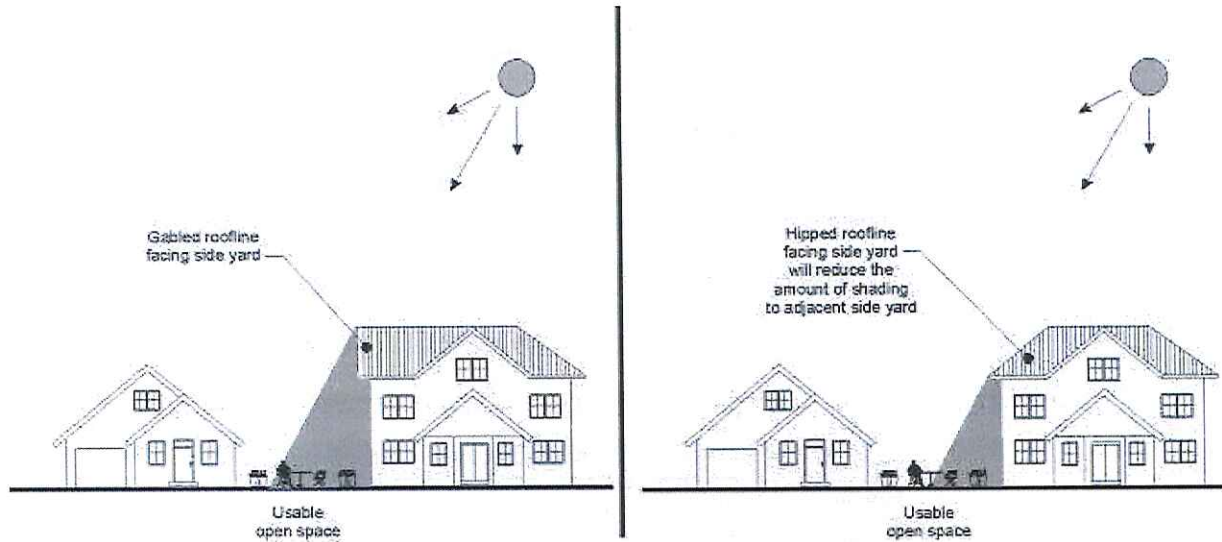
Encourage rooflines along the side yard that maximize solar access to adjacent homes and/or private open space.
